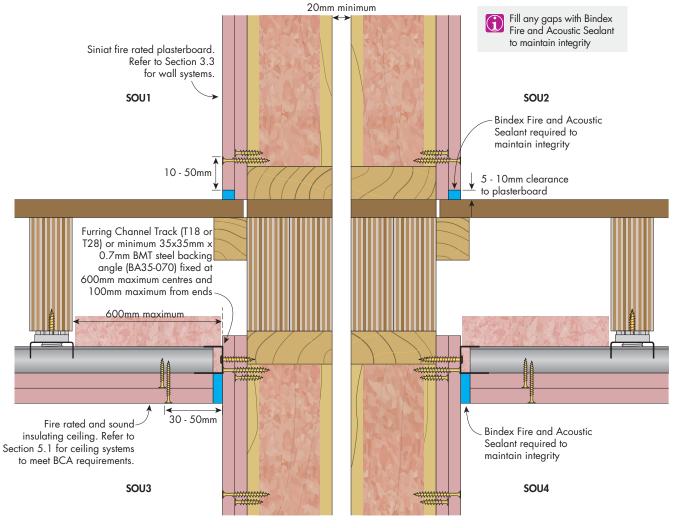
Separating Wall with Fire Rated Suspended Floor Section
